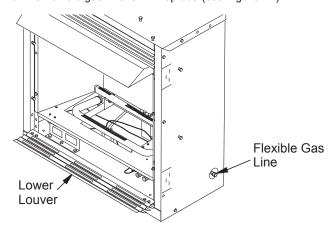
Flexible Gas Line Location (Remote-Ready Unit Shown)
